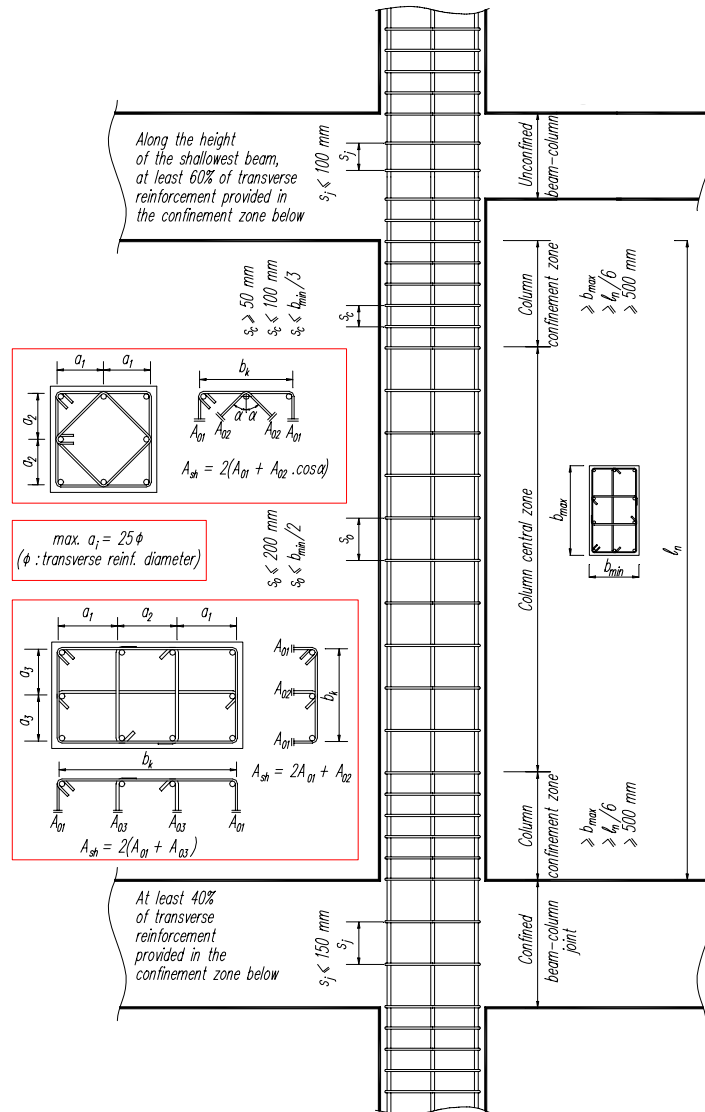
Shear Reinforcement Detailing in Columns (TEC-2007)
